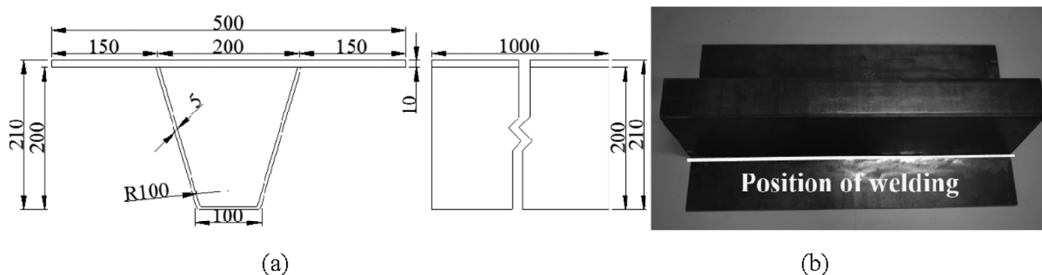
Steel box girder: (a) dimension diagram of the test piece (mm) and (b) physical map of the steel box girder specimen.
